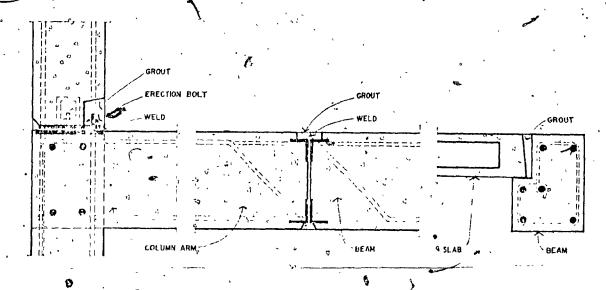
20- Componoform Typical Joint Section (Ref. 25)
